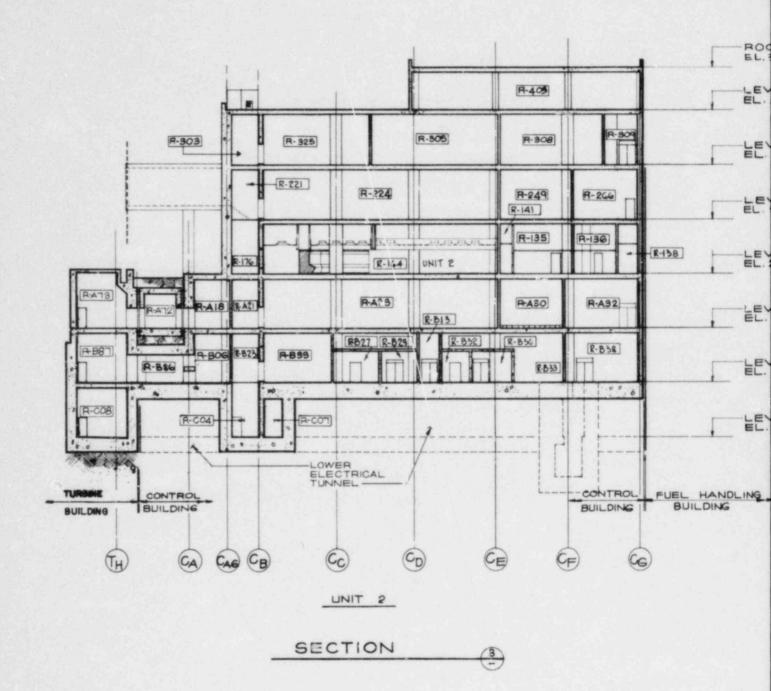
CONTROL BUILDING SECTION LOOKING NORTH
